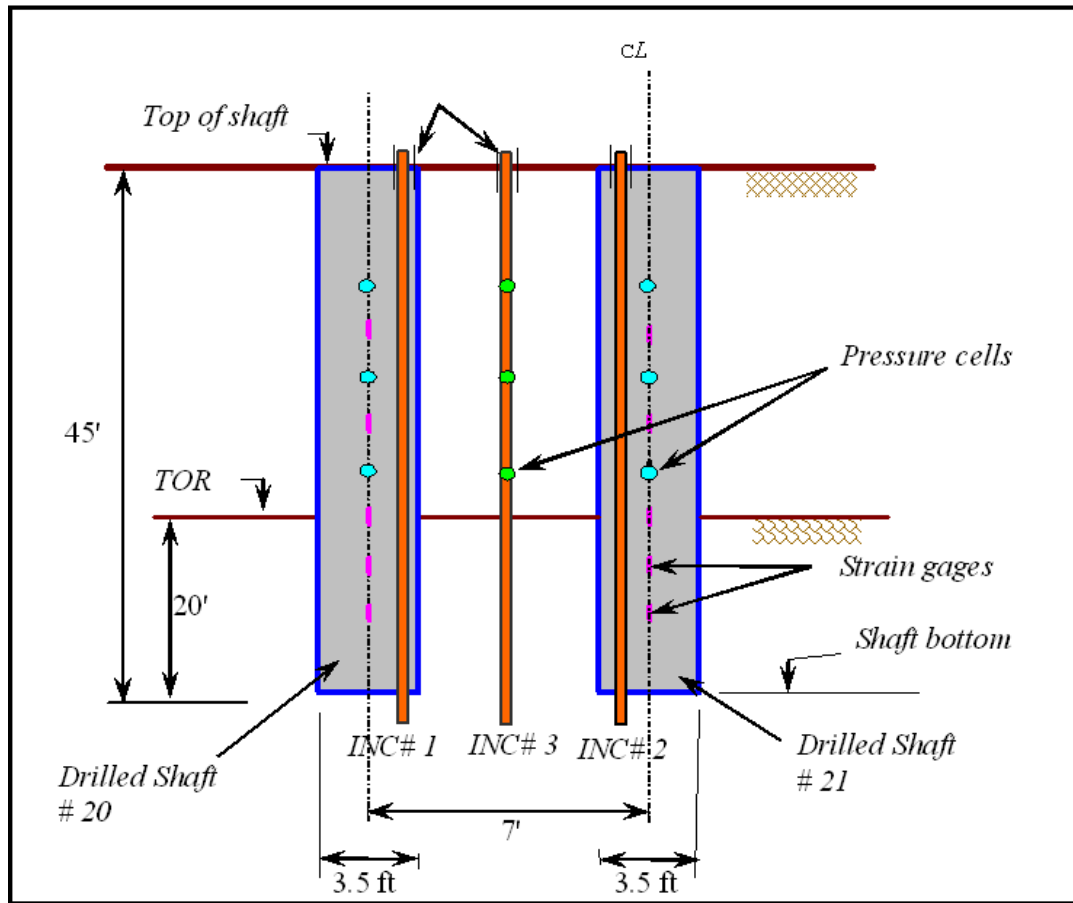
Schematic Diagram of Instrumentation Layout at JEF-152 Site
